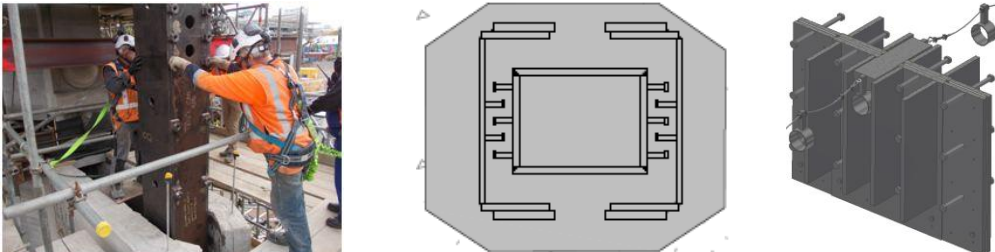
(L-R) Positioning Steel Box, Steel Box configuration, Sliding Joint section view
